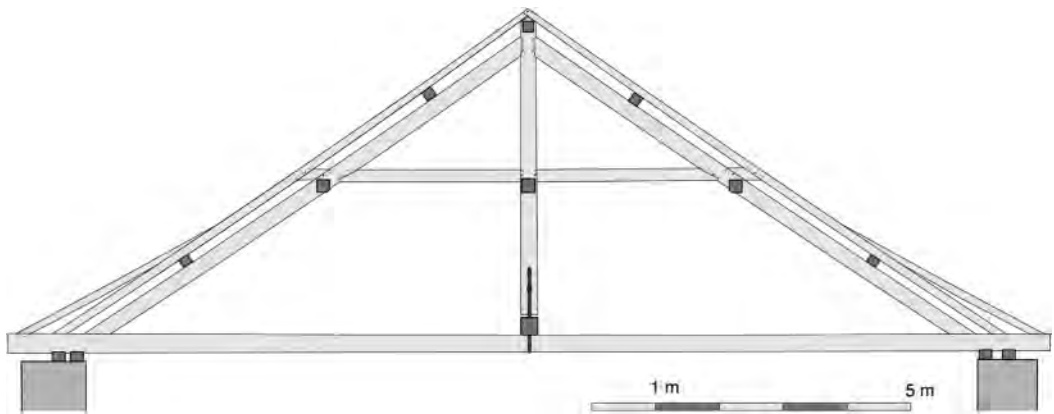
Total station survey of a principal truss of the reformed church at Embrach (Schäfer 2020).
